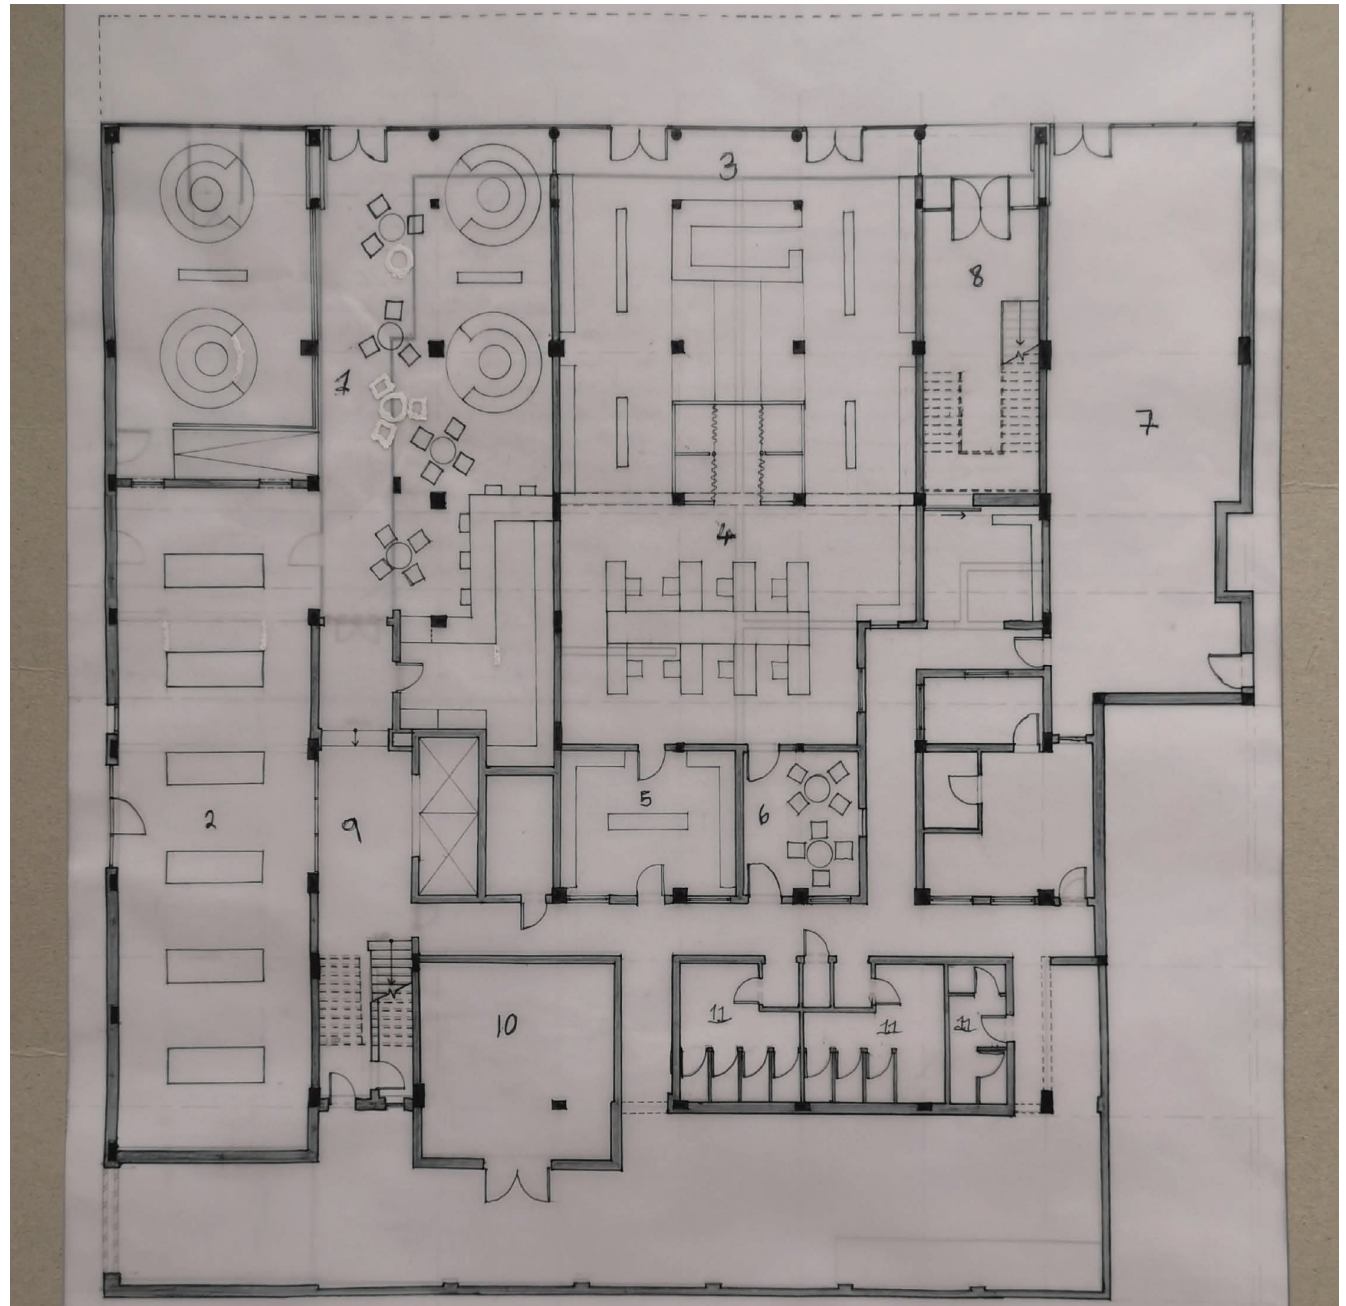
First draft of ground floor layout plan (June 2019)
